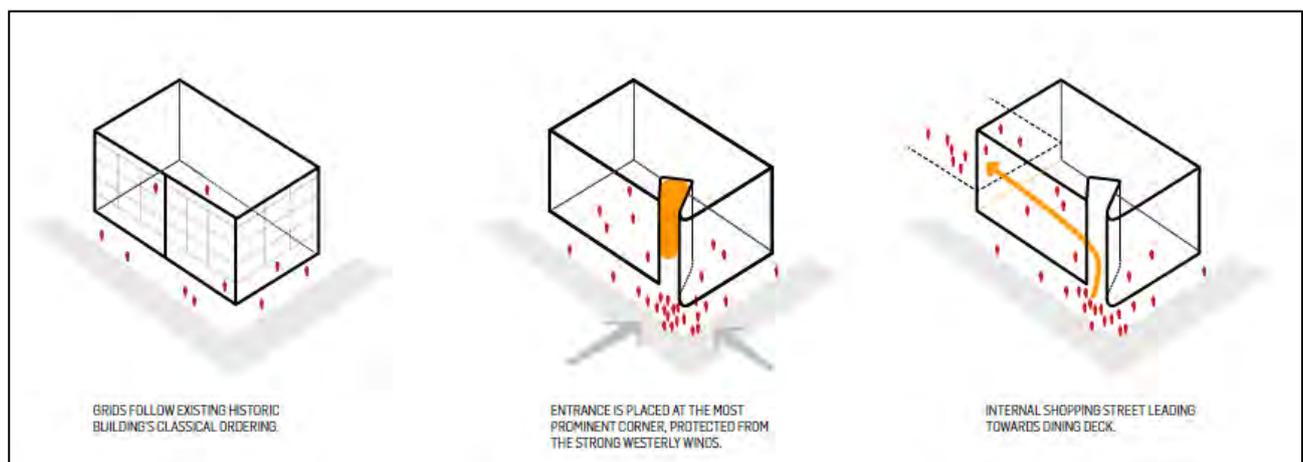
Consideration of proposed building that will replace the Newburgh and Lewis & Co Buildings (image courtesy of Buchan Group, December 2018).
